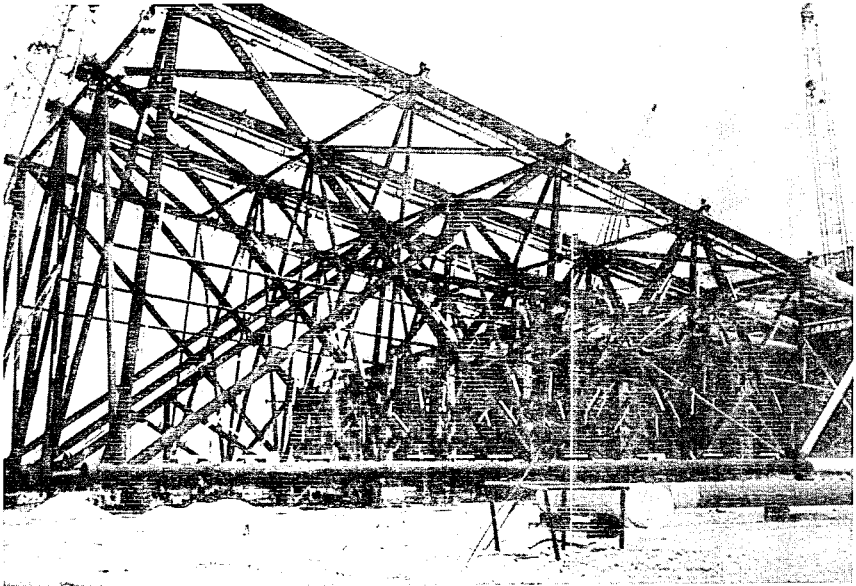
platform jacket under construction at Ardersier, near Inverness. When completed, the structure is towed to the drilling site and fixed on the ocean floor. *Photo by George A. Doumani.
